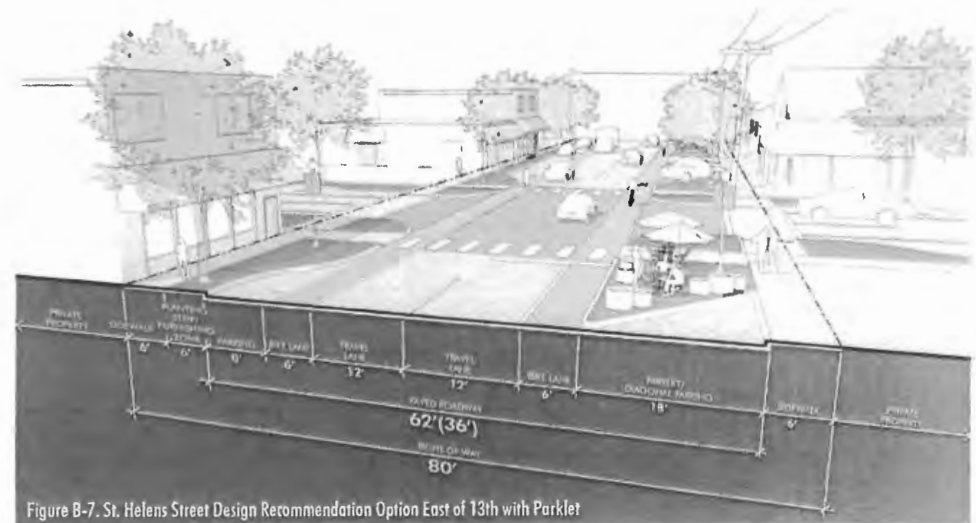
St. Helens Street Design Recommendation Option East of 13th with Parklet
